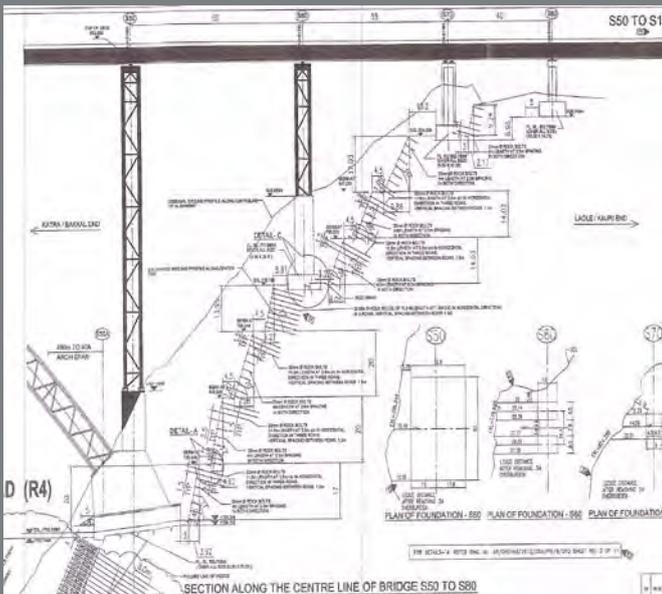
Typical cross section of the slope with rock bolting scheme from s50 to S80
